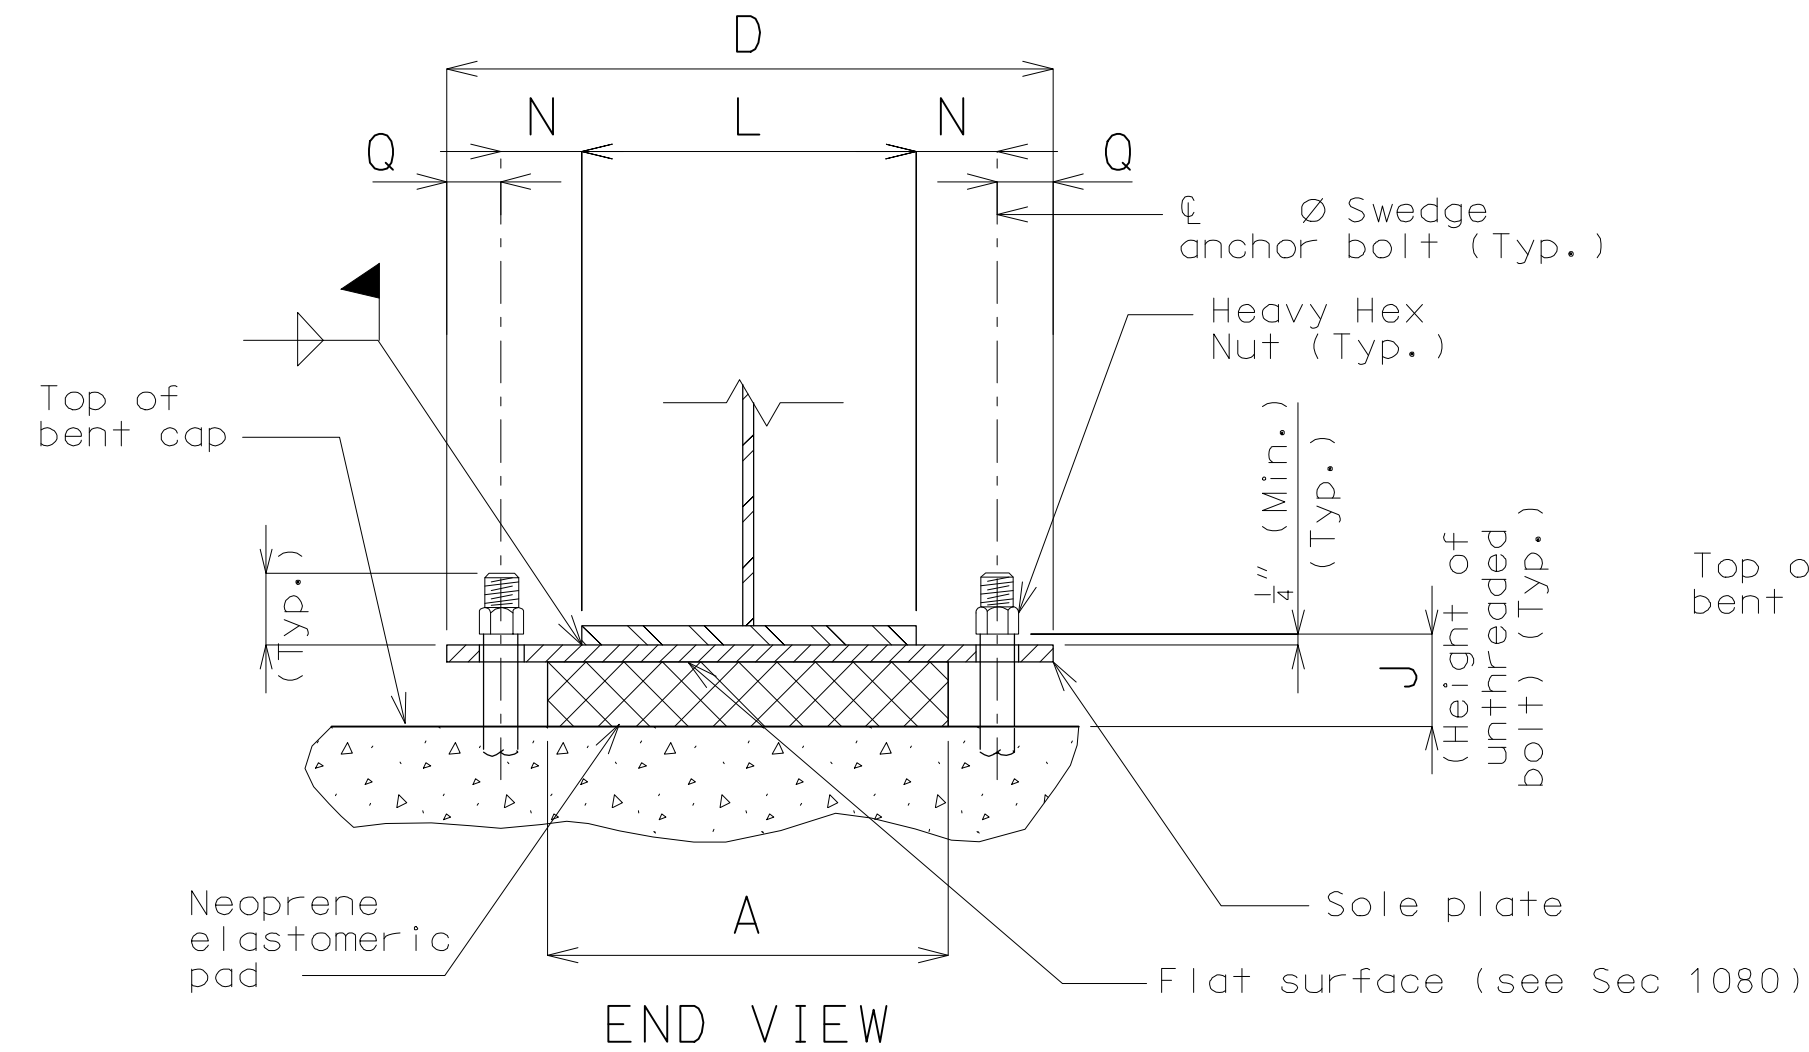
/4" Ø THRU 2 1/2" Ø ANCHOR BOLTS
